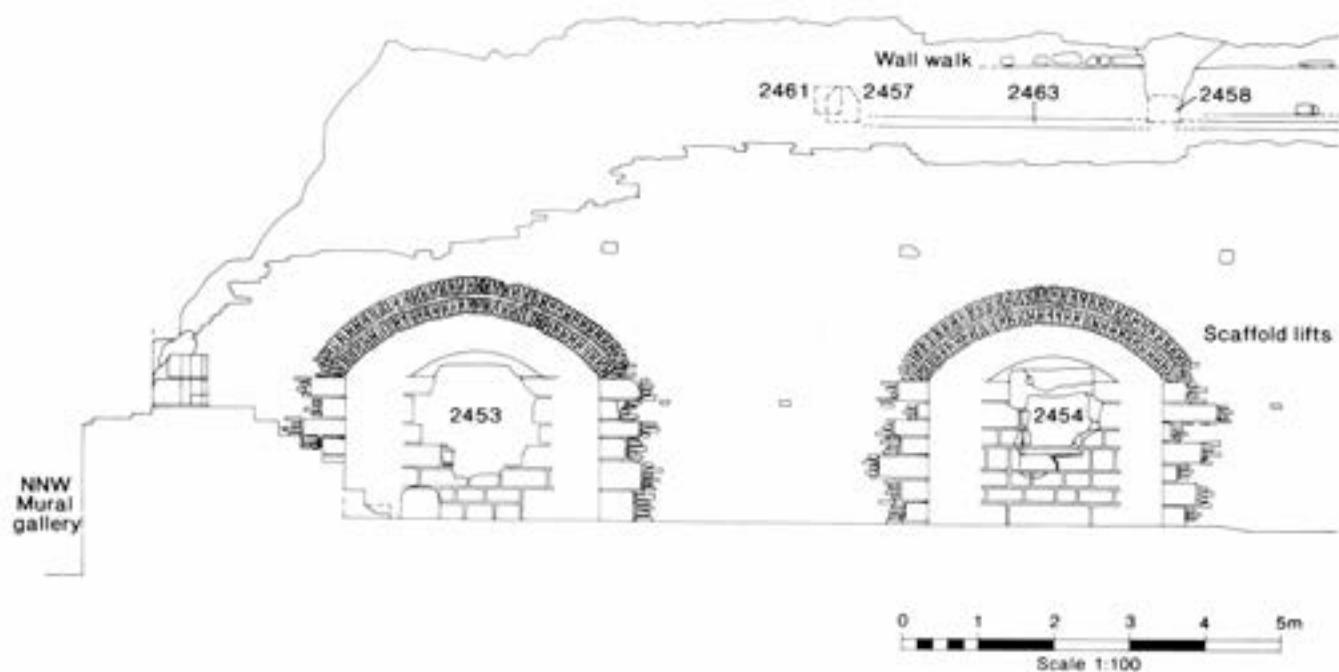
N Bastion: elevation of interior face of north-west wall showing roof timber positions and scaffold lifts
